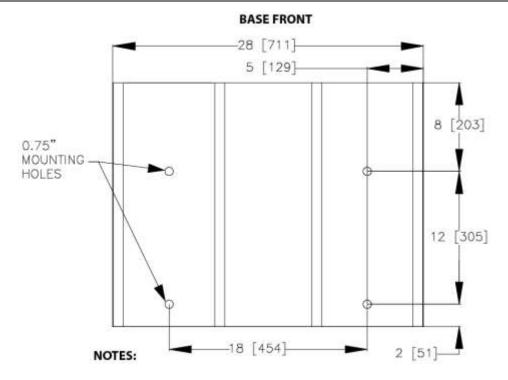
BMK750-1000 Anchor Bolt Locations
